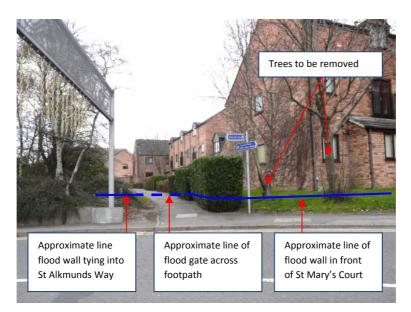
Layout of proposed flood defence by footpath adjacent to St Mary's Court
